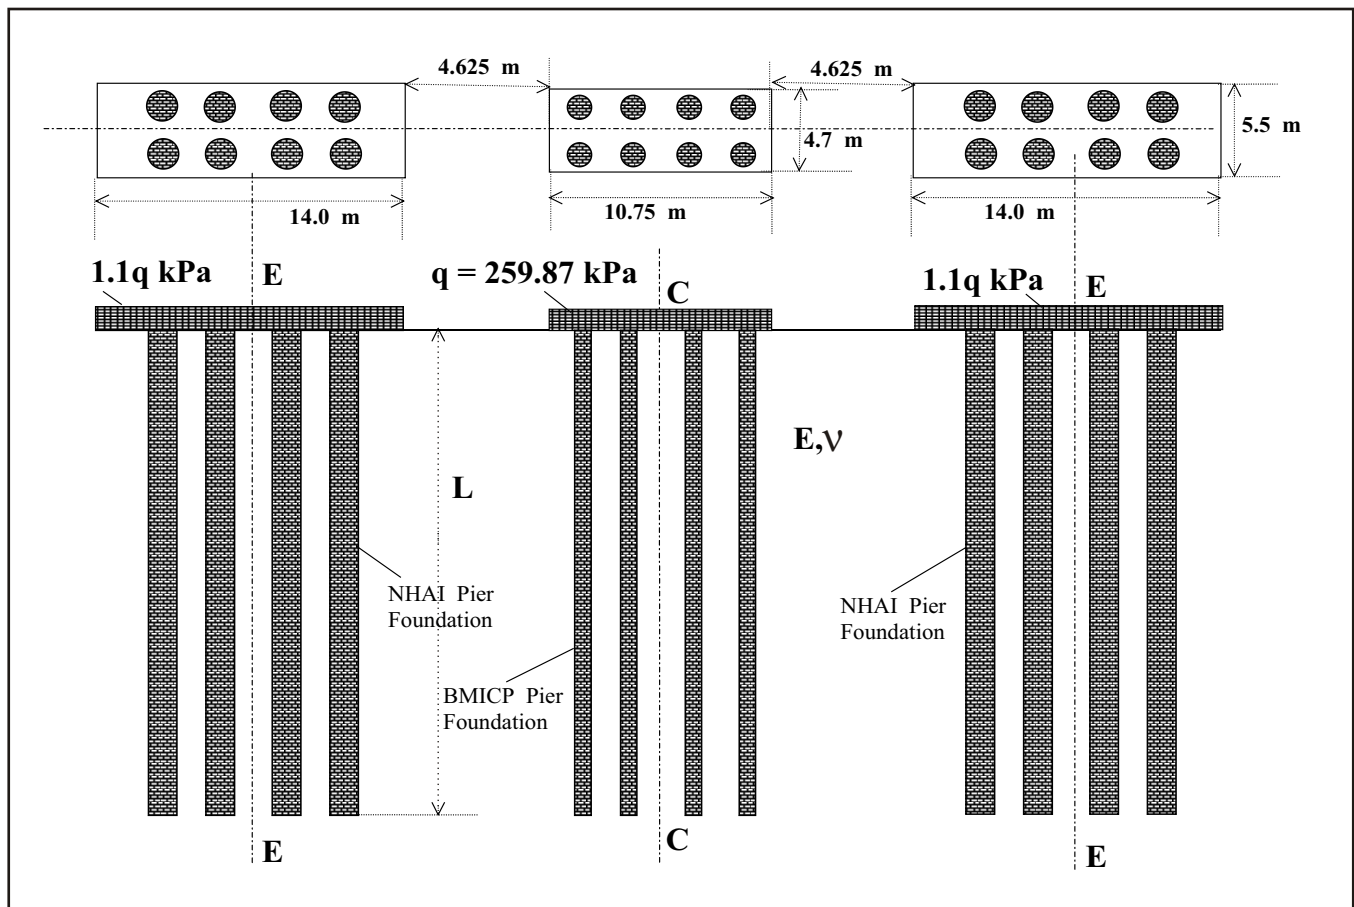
Pile cap and loading pattern for three adjoining piers as per Drawing: BMIC/NHAI/STRU/1.7
